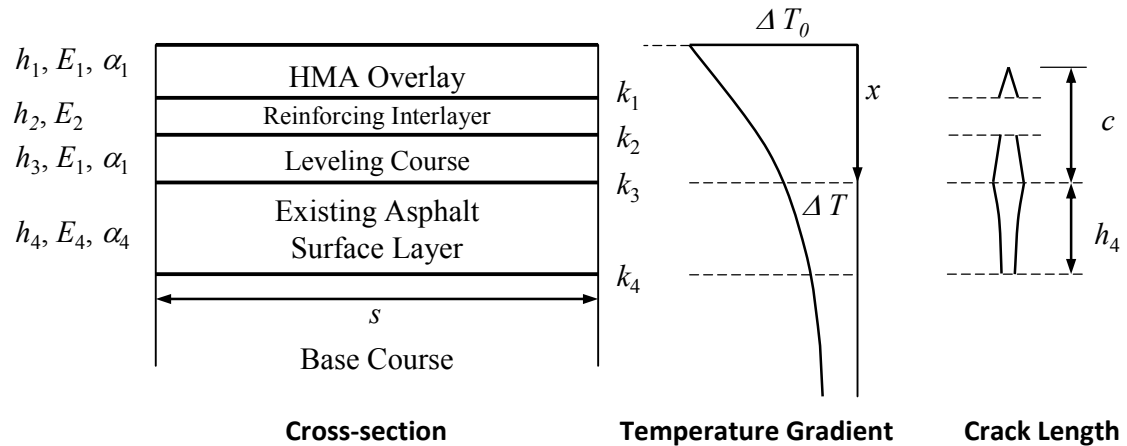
Diagram of HMA overlay on asphalt concrete pavement with reinforcing interlayer beneath overlay-thermal.
